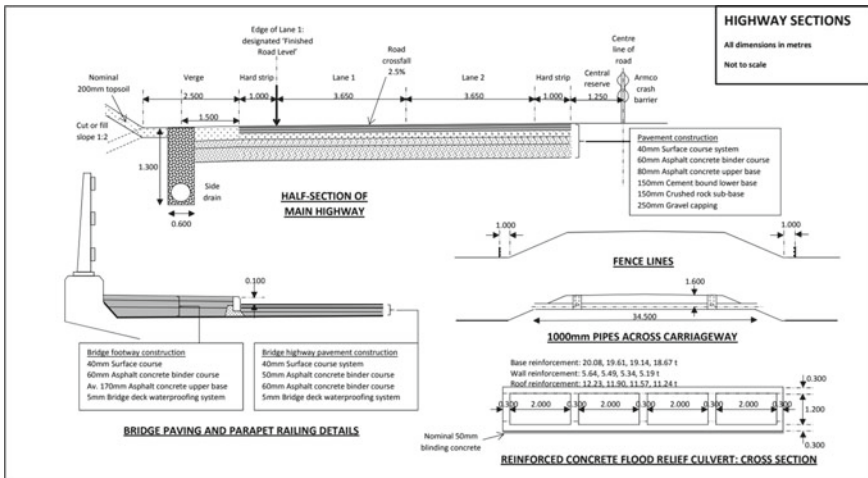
Highway cross section, drainage system, culverts, and bridge pavement cross section
